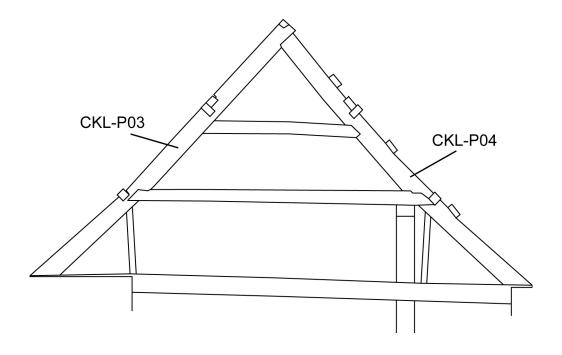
Truss 3 looking south, showing the location of samples CKL-P03 and CKL-P04 (after lan Wells)
